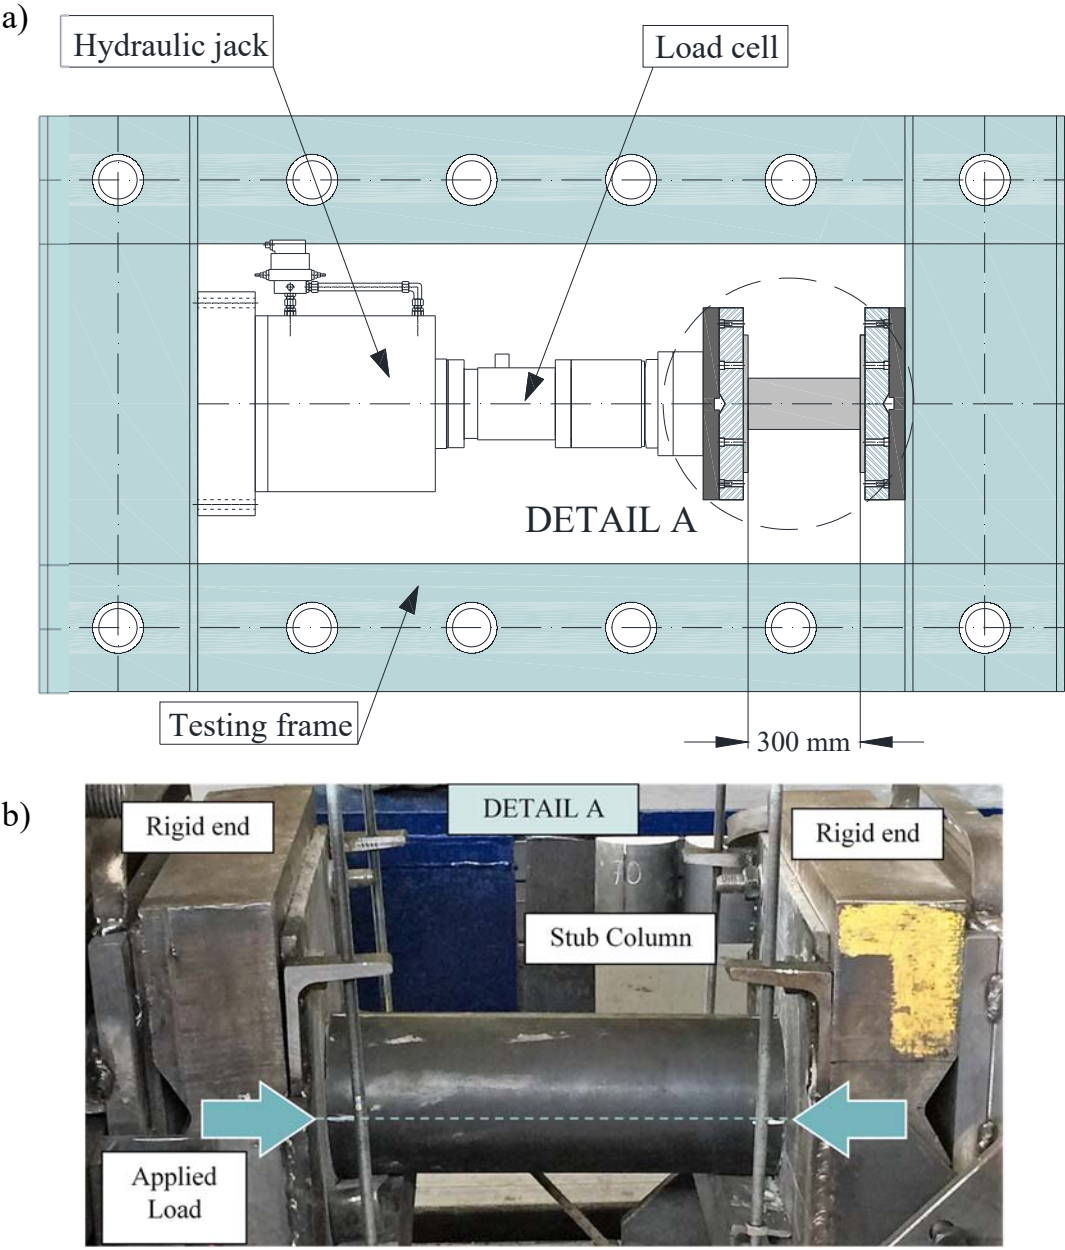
a) Scheme of test setup; b) Detail of the test setup for one of the columns (Detail A).
